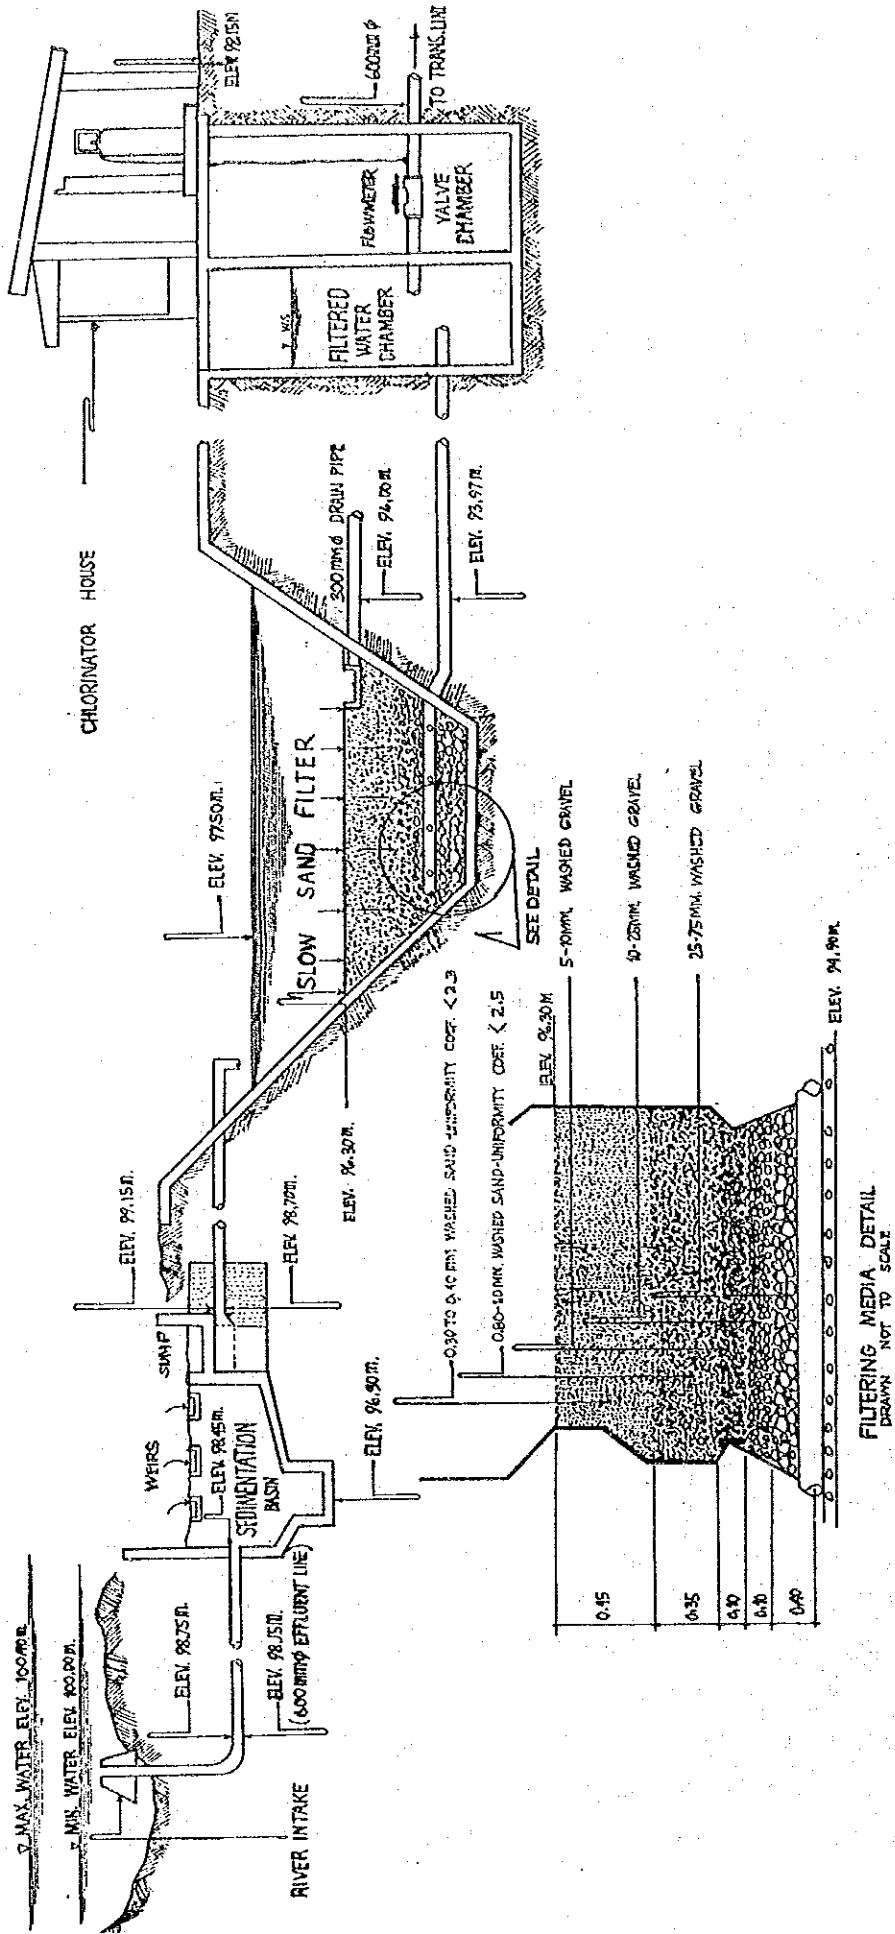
Structural Concept of Facilities of Existing Tingib Treatment Plant
